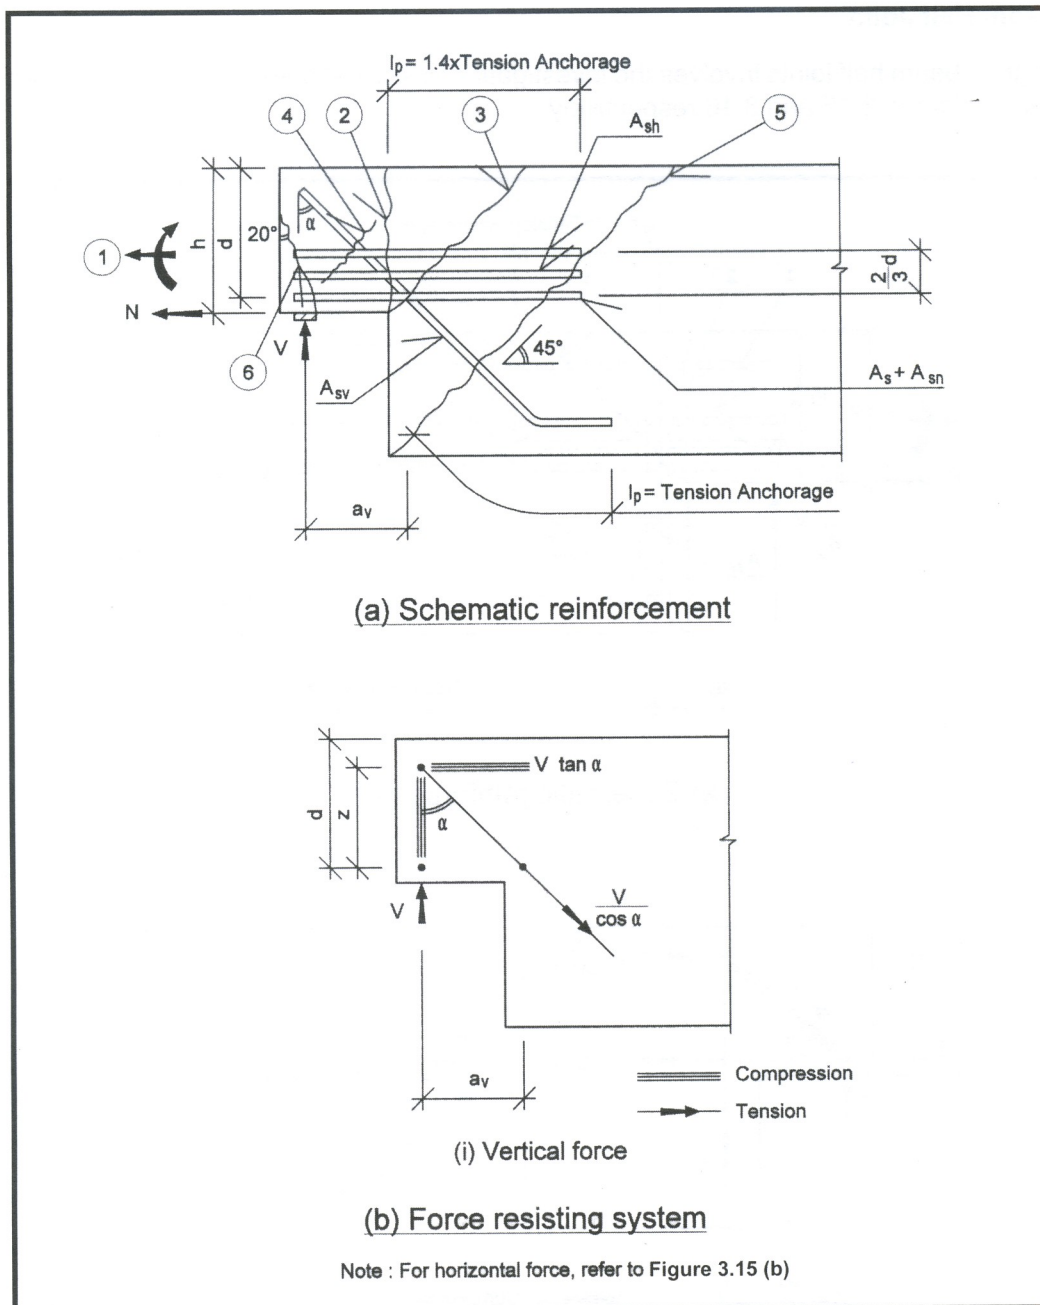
Alternative Reinforcement And Force Resisting System In Beam Half Joint
